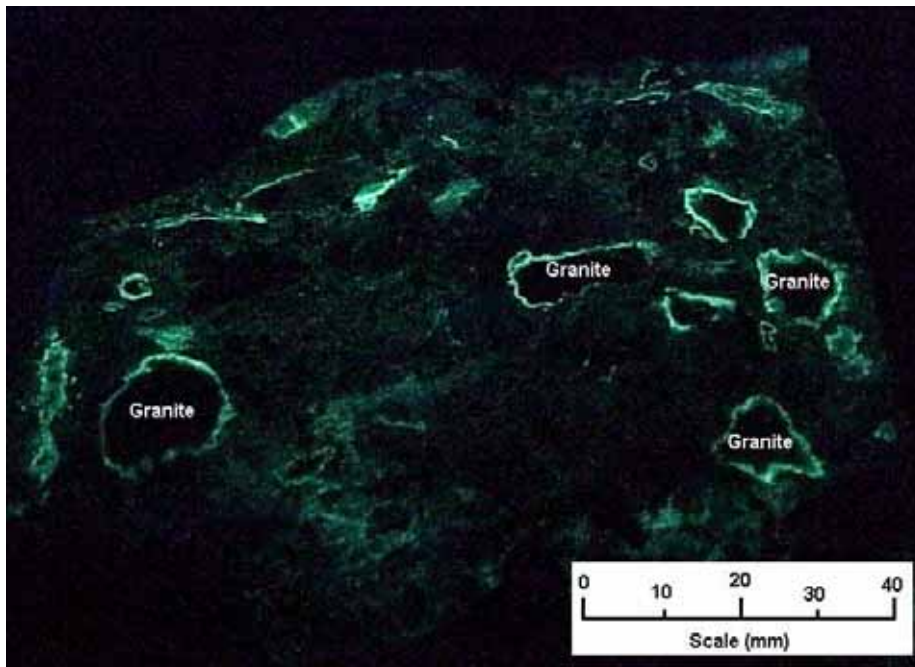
UV light analysis on piece of cement from a bridge over I-93 in Salem, NH. Same concrete sample as shown in photo 14.
